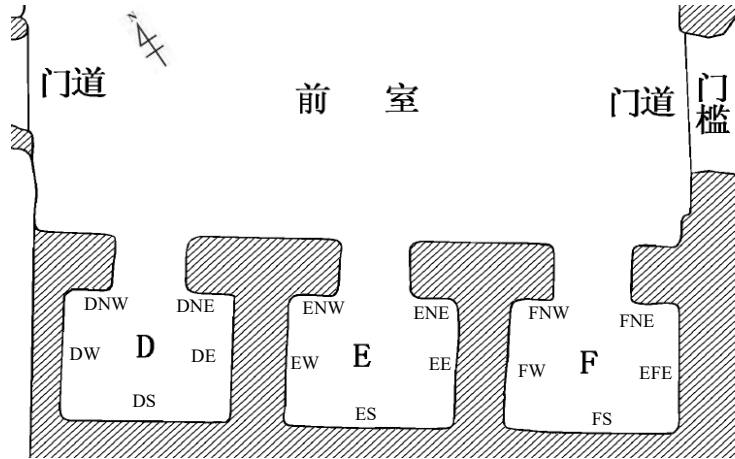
Plan of Chambers D, E, F of Cave 26
